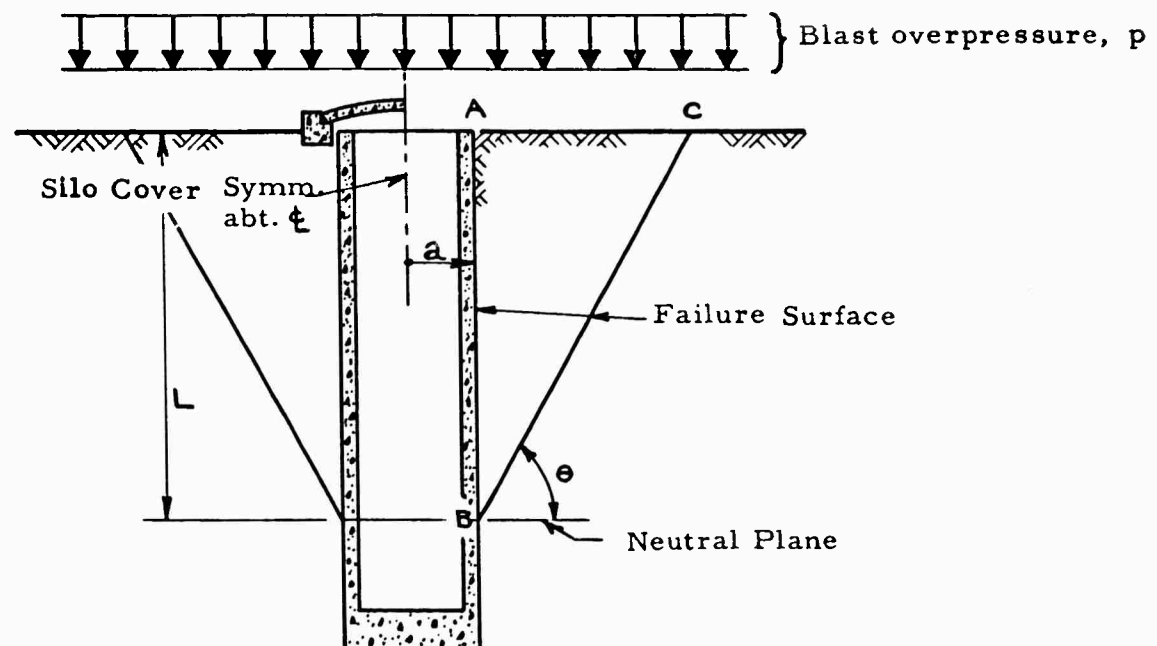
SECTION THROUGH SILO SHOWING ASSUMED FAILURE SURFACE
